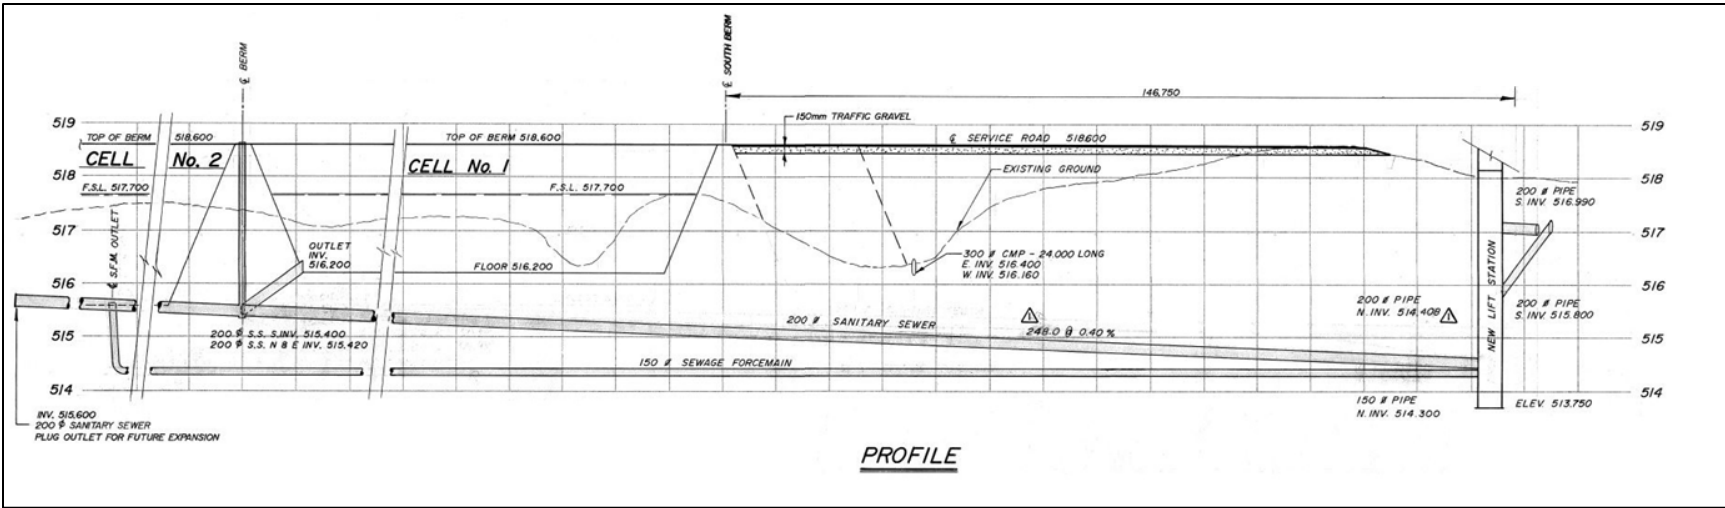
1988 Construction drawing - Elevation profile of sewage force main and sanitary main lines (Modified from Bullée Consulting Ltd. 1988b)
